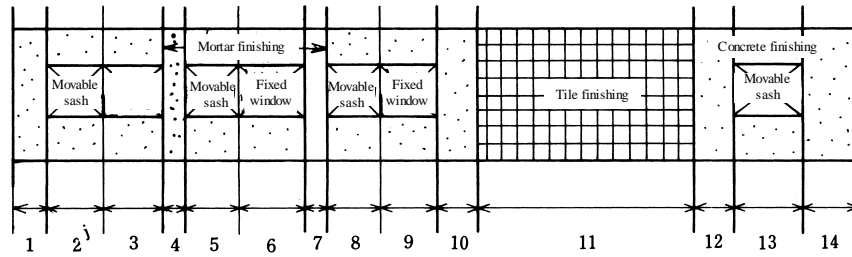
Division into unit portions of a wall with different vertical construction methods
